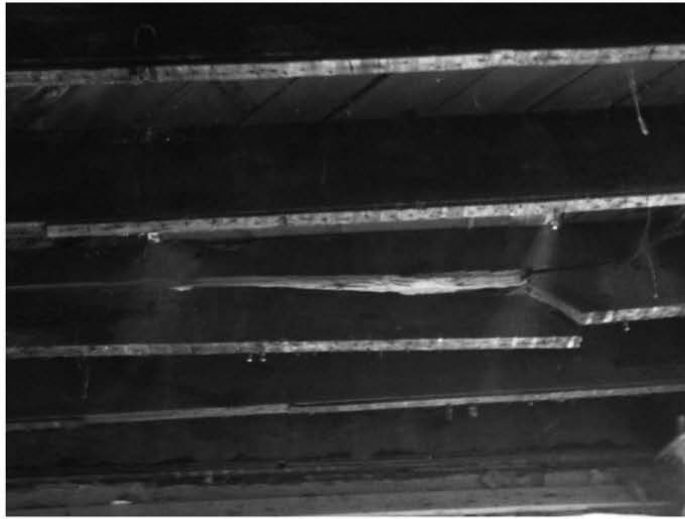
Damaged Floor Joists @ Second Floor
